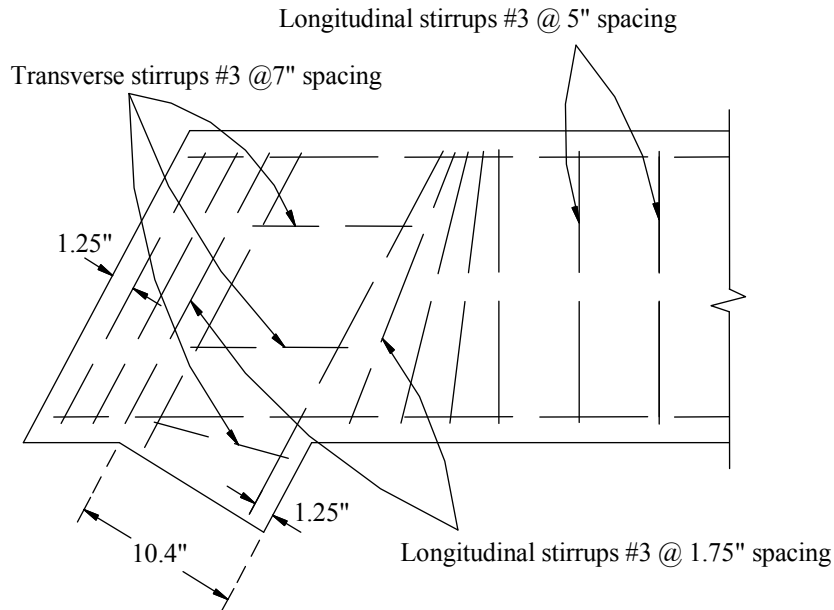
Reinforcement of exterior box-beams at the end diaphragm.
